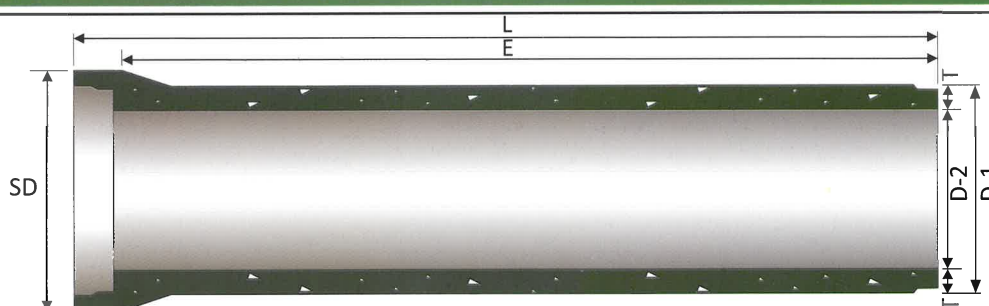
Typical cross section of Spigot & Socket Concrete Pipe
